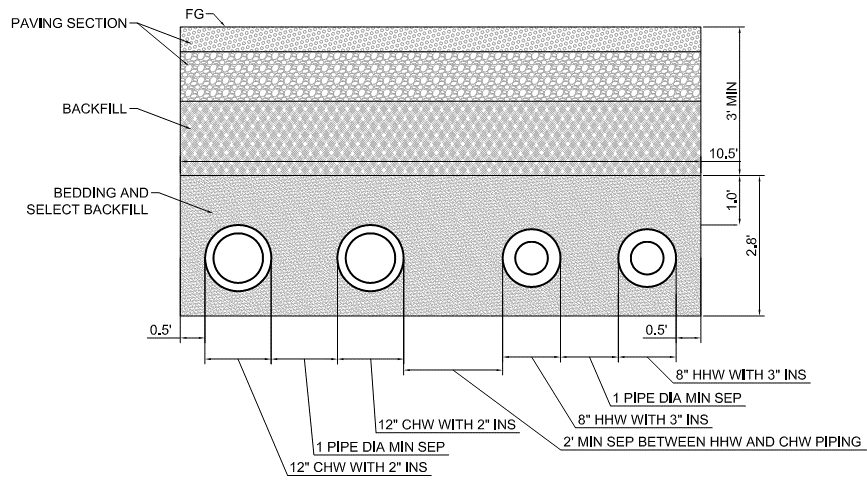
Chilled and Hot Water Combined Trench - Maximum Section
